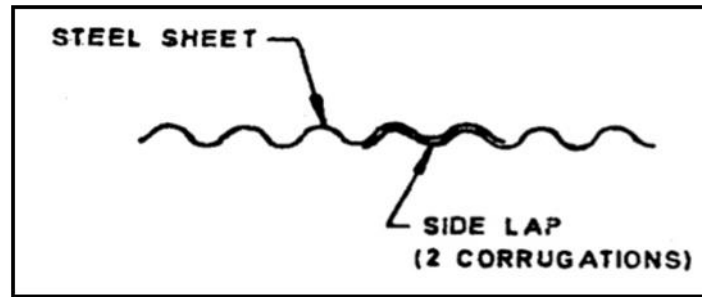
Overlapping of corrugated galvanized steel sheet
